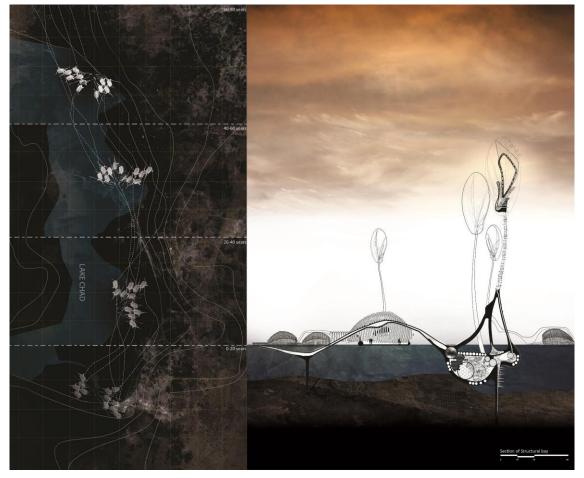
Site plan shows transient Bloom Archive transported to many sites over time as water replenishes Lake Chad. Section shows module of one Bloom and refugee pod. *Source: Nusrat Mim
